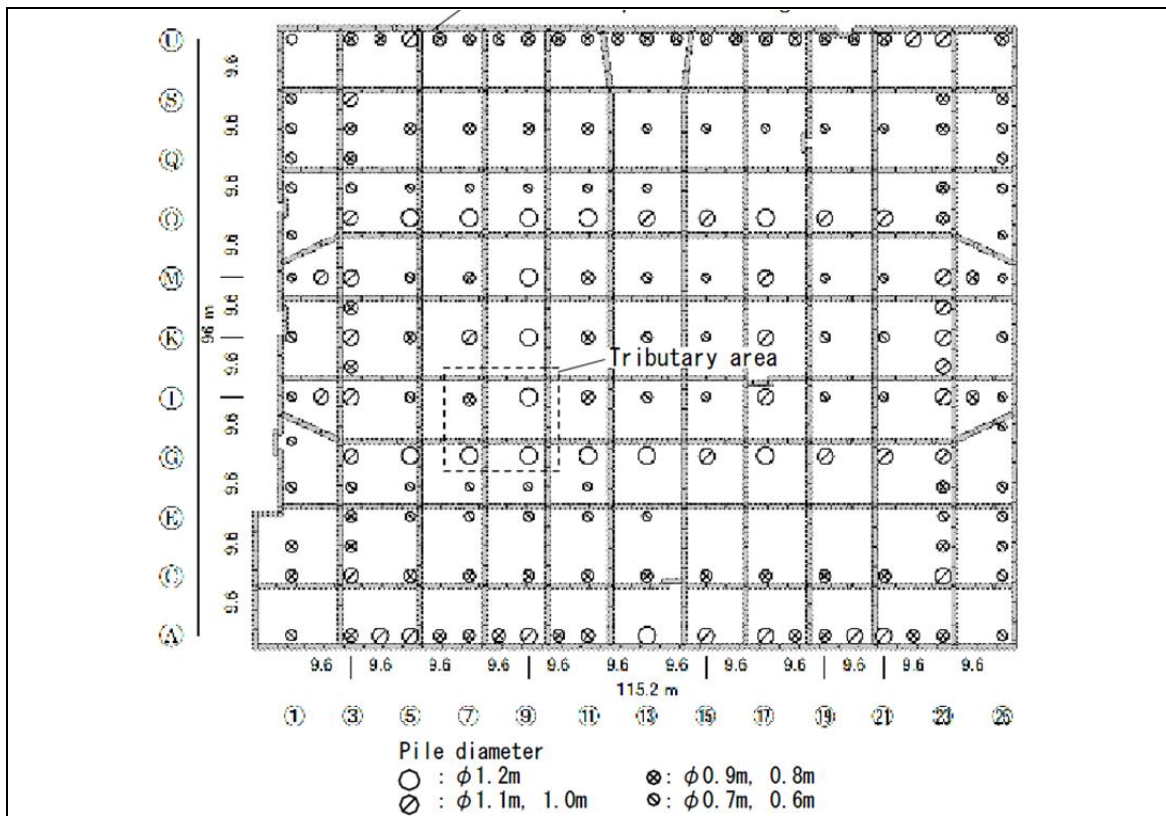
Layout of piles and grid-form deep cement mixing walls (Yamashita et al., 2013)
